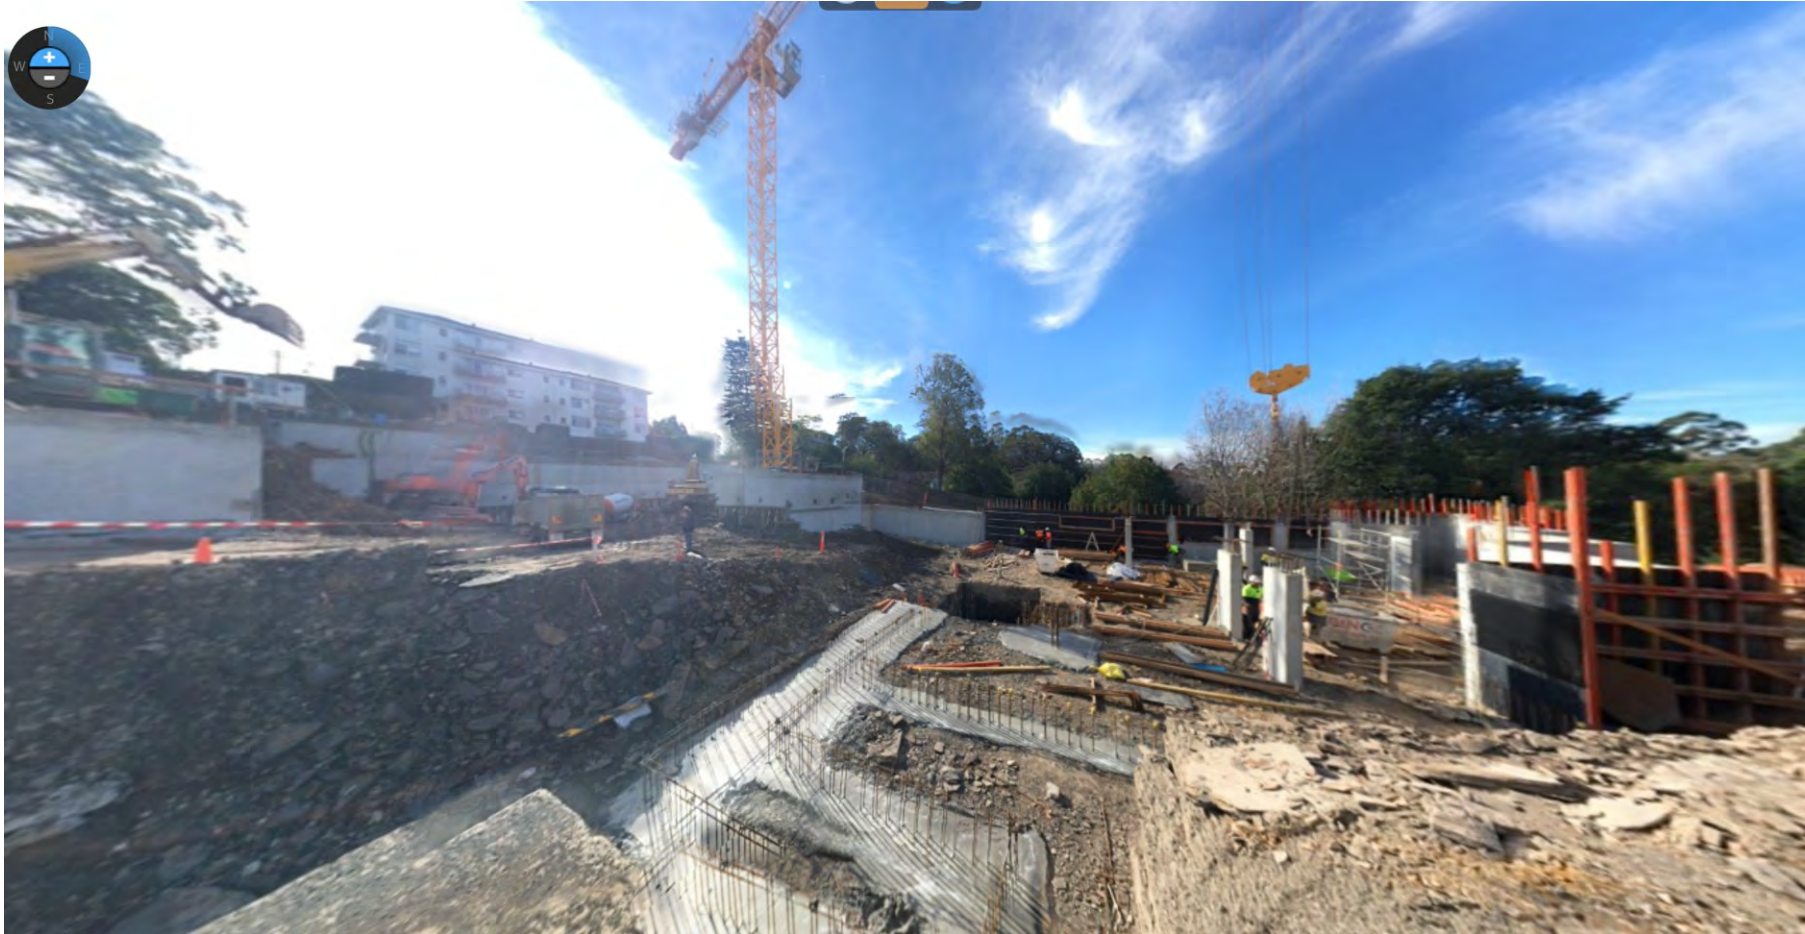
The photo below from the 23rd of June shows the extent of excavation on Building B, approximately 2-3m above the final reduced level.
